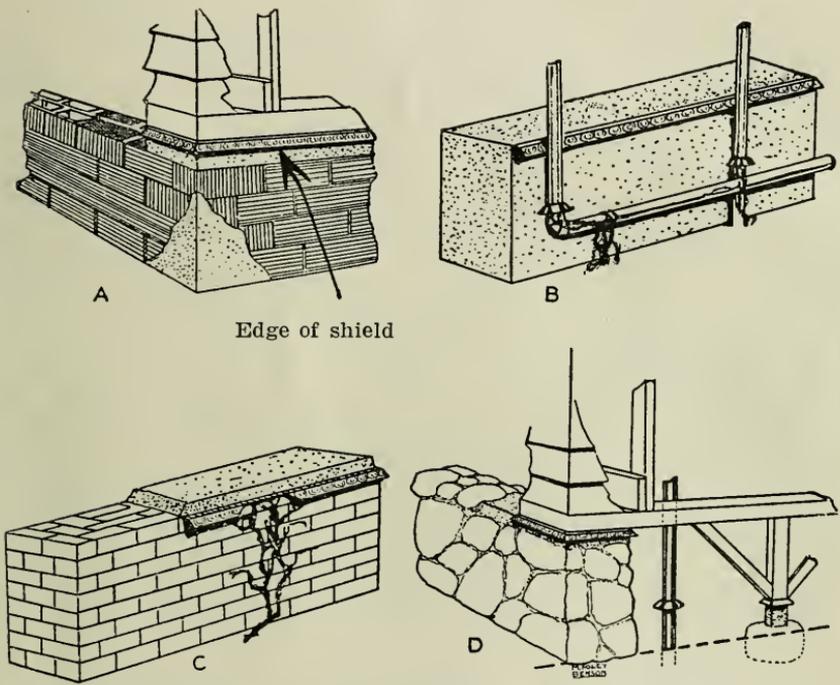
How to insulate foundation units of hollow tile or solid masonry against termites
